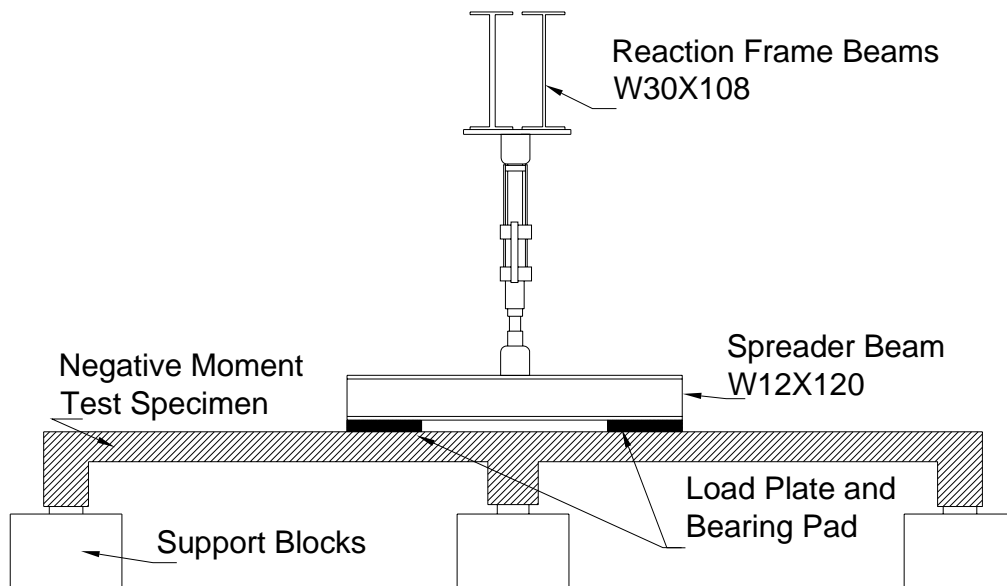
Elevation of Negative Moment Specimen Reaction Frame (Section B-B)
